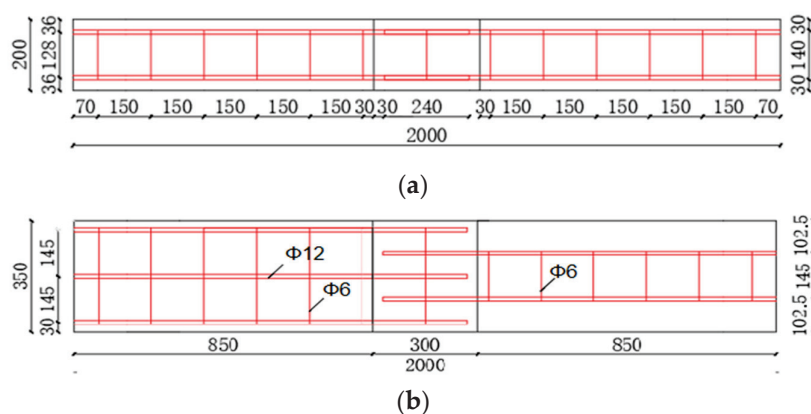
Configuration of the test specimens (unit: mm). (a) The elevation of the specimens. (b) The plan of the specimens.
